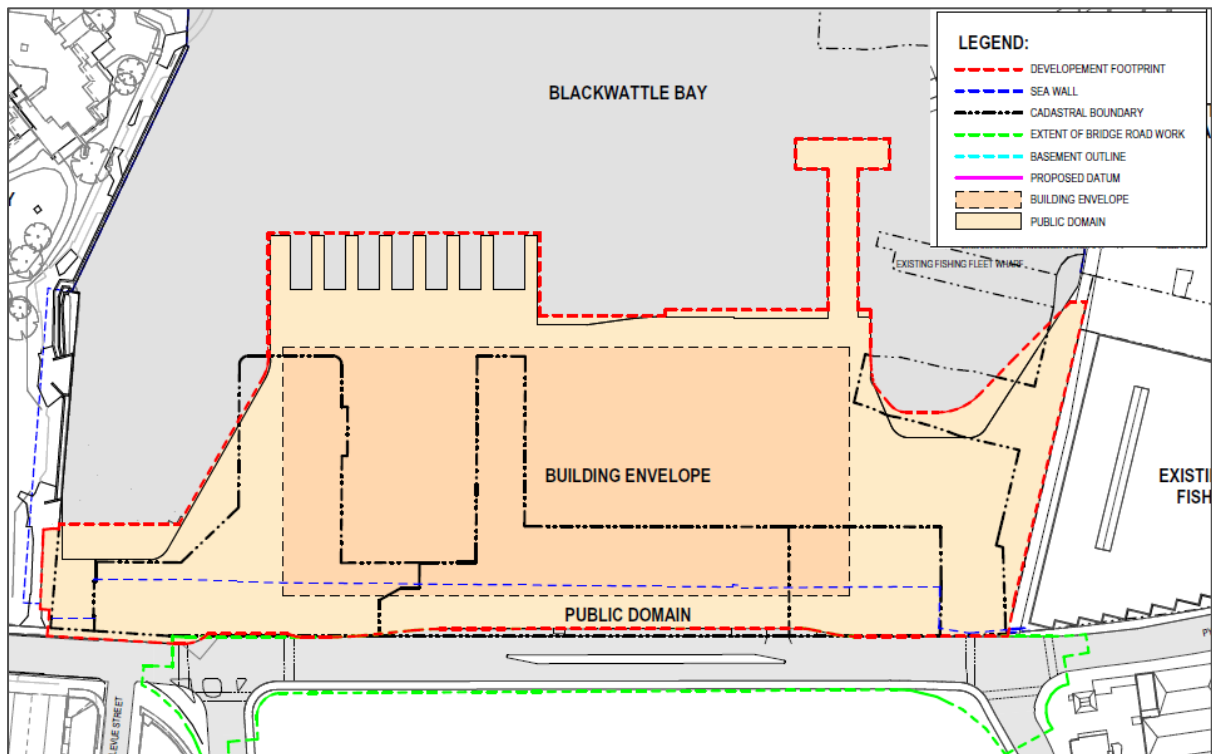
| Extract of the Building Envelope Plan and Public Domain Plan (Source: EIS)
